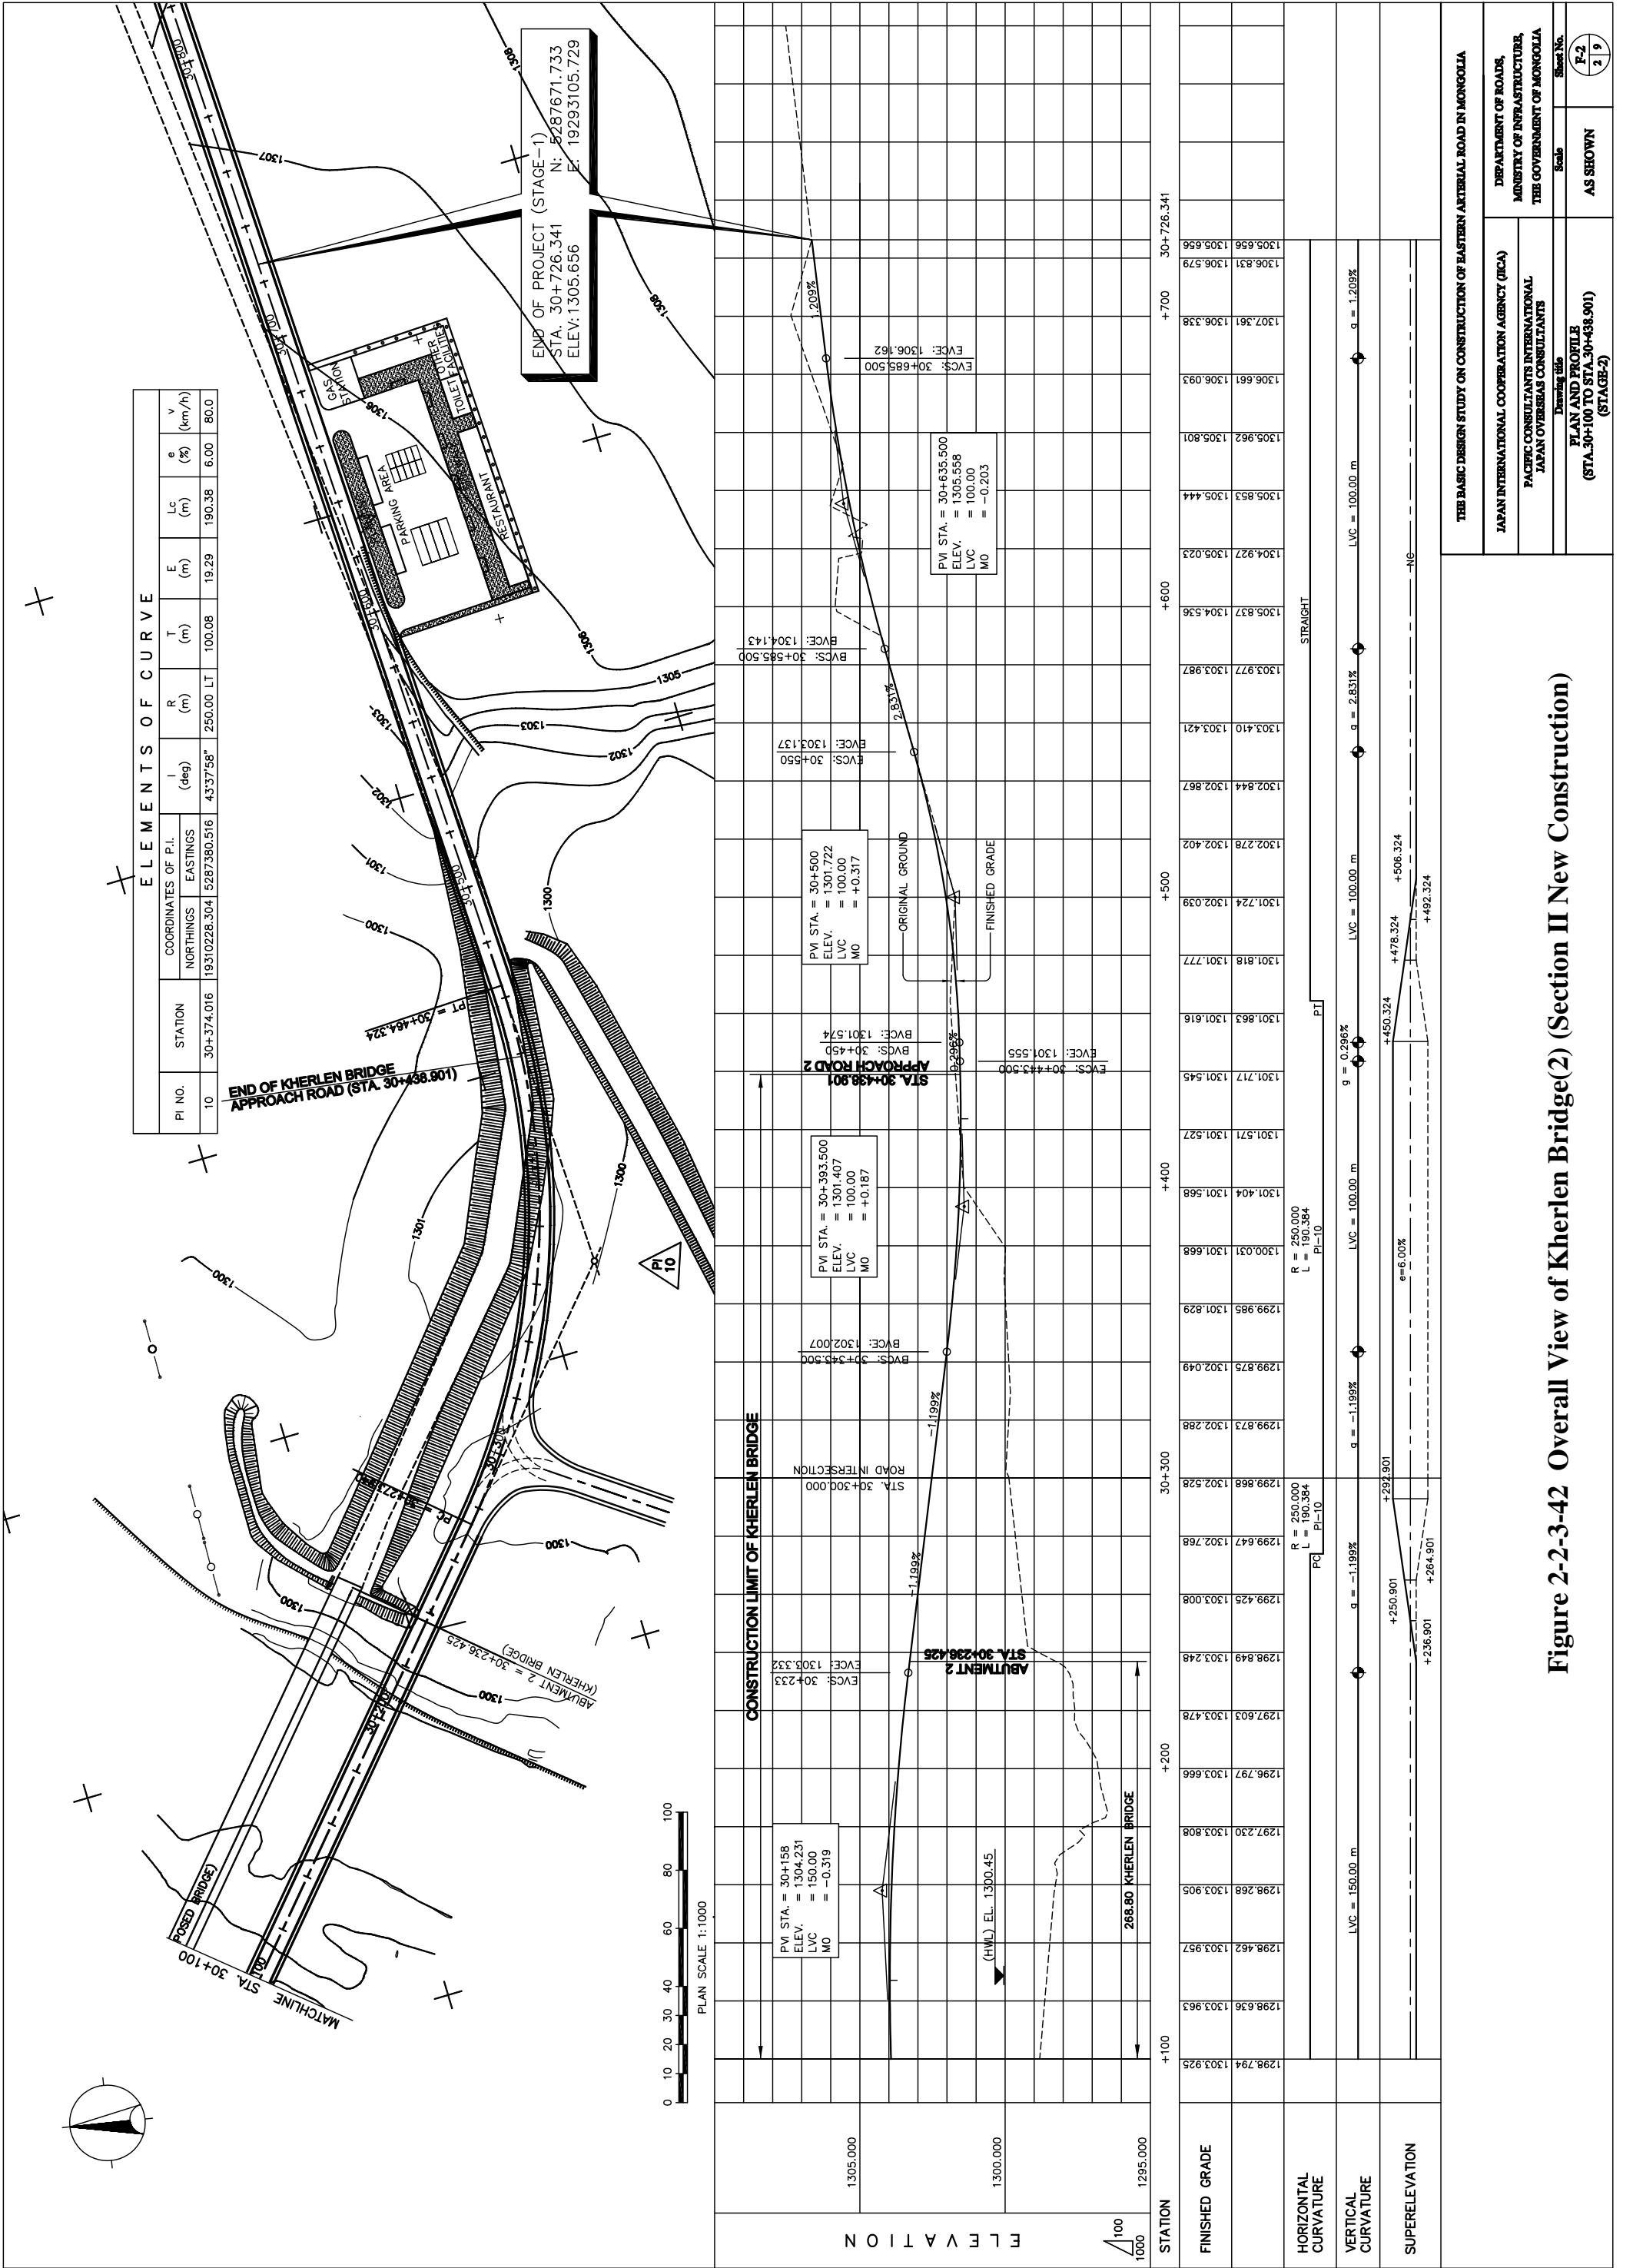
Overall View of Kherlen Bridge(2) (Section II New Construction)
